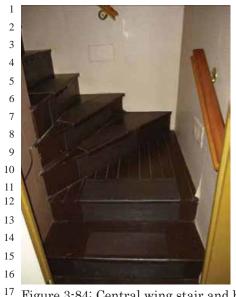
Central wing stair and handrails to room 204, ABA 12/6/11
